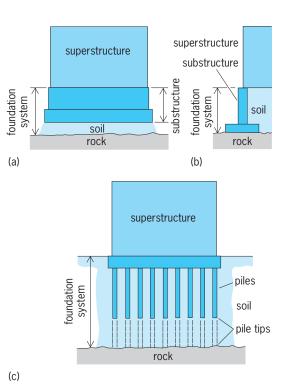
Examples of foundation systems. (a) Structure supported on a foundation bearing on soil. (b) Structure supported on a foundation bearing on rock. (c) Structure supported by a pile foundation. The piles may be installed so that the pile tips terminate in soil and all support is derived from the soil, or they may be installed so that the tips penetrate to rock.
